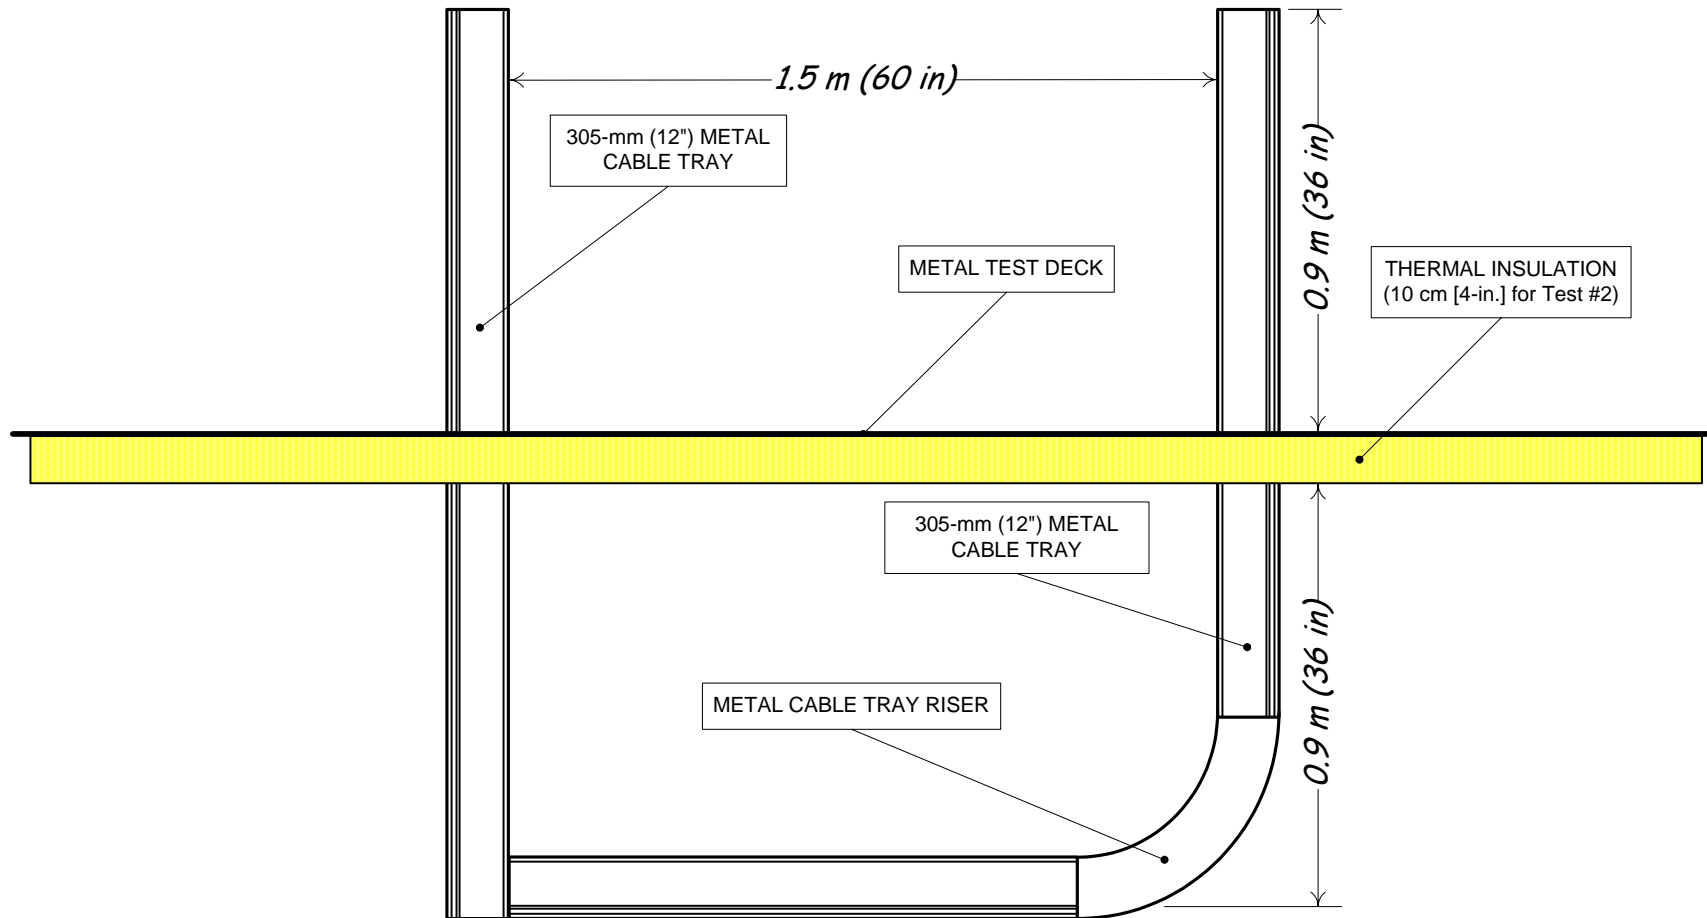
305-mm (12-in) cable tray test specimens (side view with dimensions). Cable trays will be ladder type, 18-gage galvanized steel with 10 cm (4 in) high side rails and 23 cm (9 in) rung spacing.
